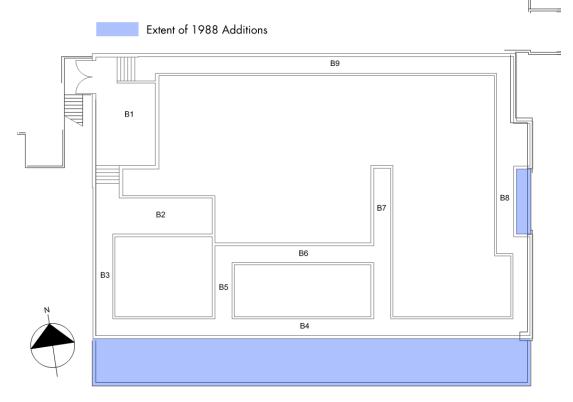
Surgical Block – Foundation Plan (including 1988 Additions)
